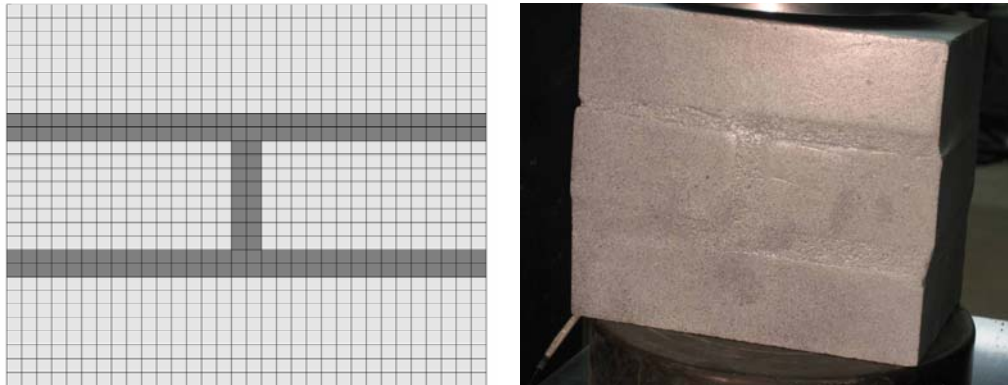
The tested masonry specimen (right) and the FVDAM model (left)
